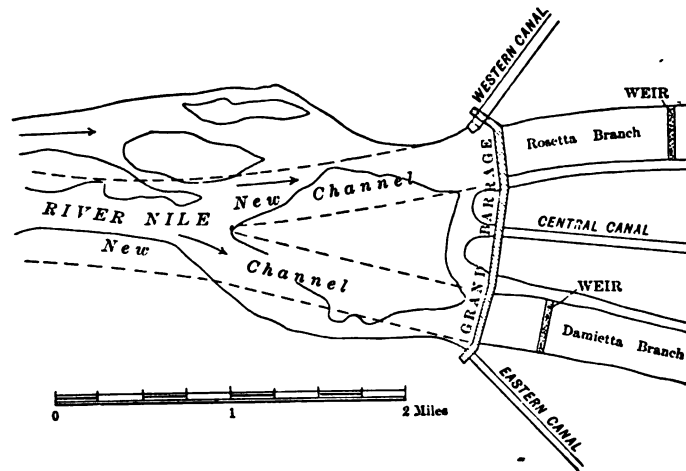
PLAN OF THE GRAND BARRAGE.
